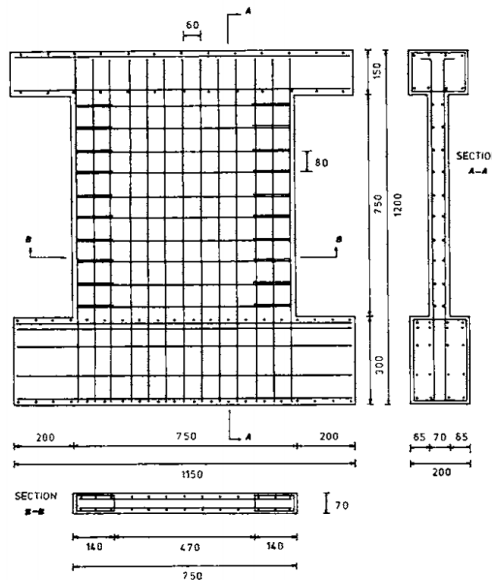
Geometry and reinforcement layout of Type I walls (32)
